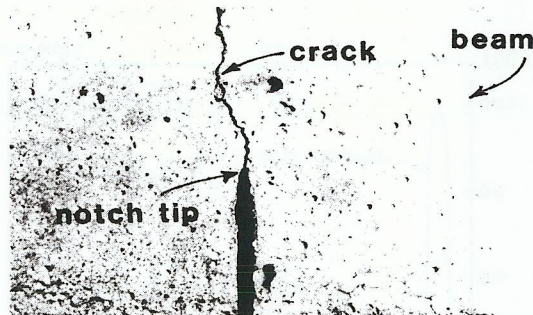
Side view of fracture surface in a notched mortar beam specimen.
